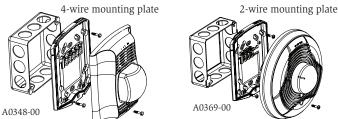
SURFACE MOUNT BACK BOX MOUNTING:
